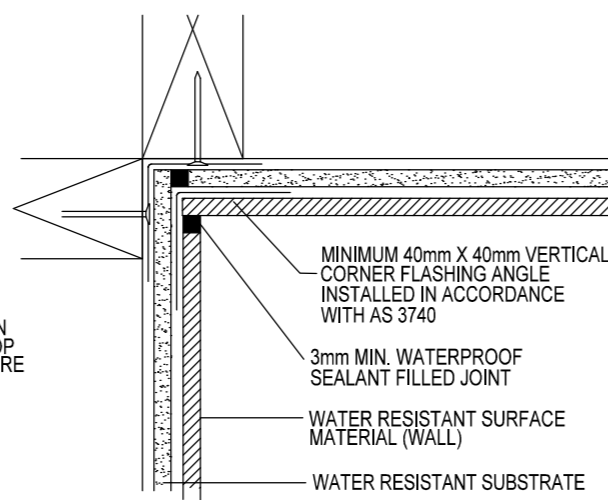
IMPERVIOUS WALL JUNCTIONS (SHOWER AREA)
